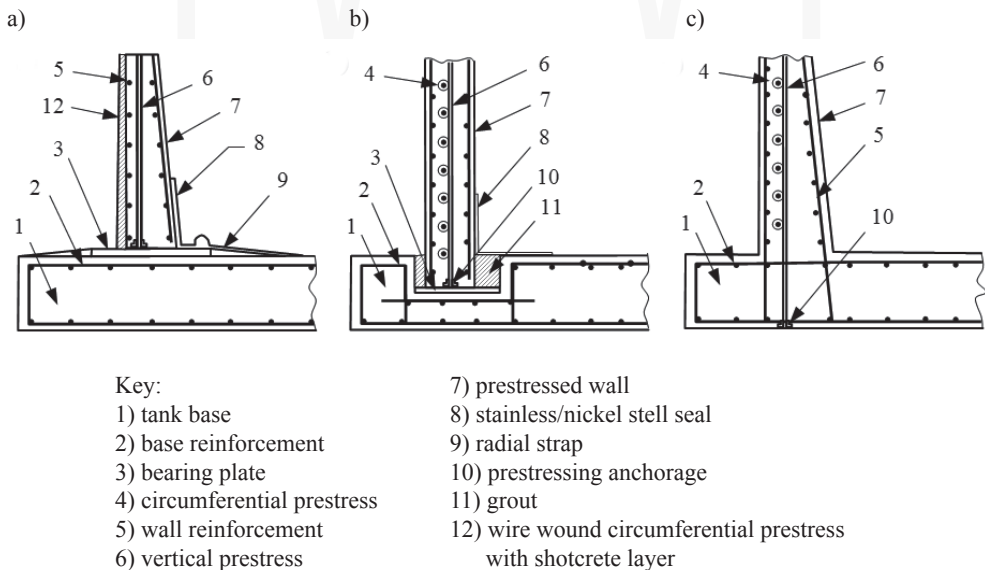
Typical connections between the prestressed tank wall and the base: a) sliding joint, b) pinned joint, c) fixed joint [1.3]
